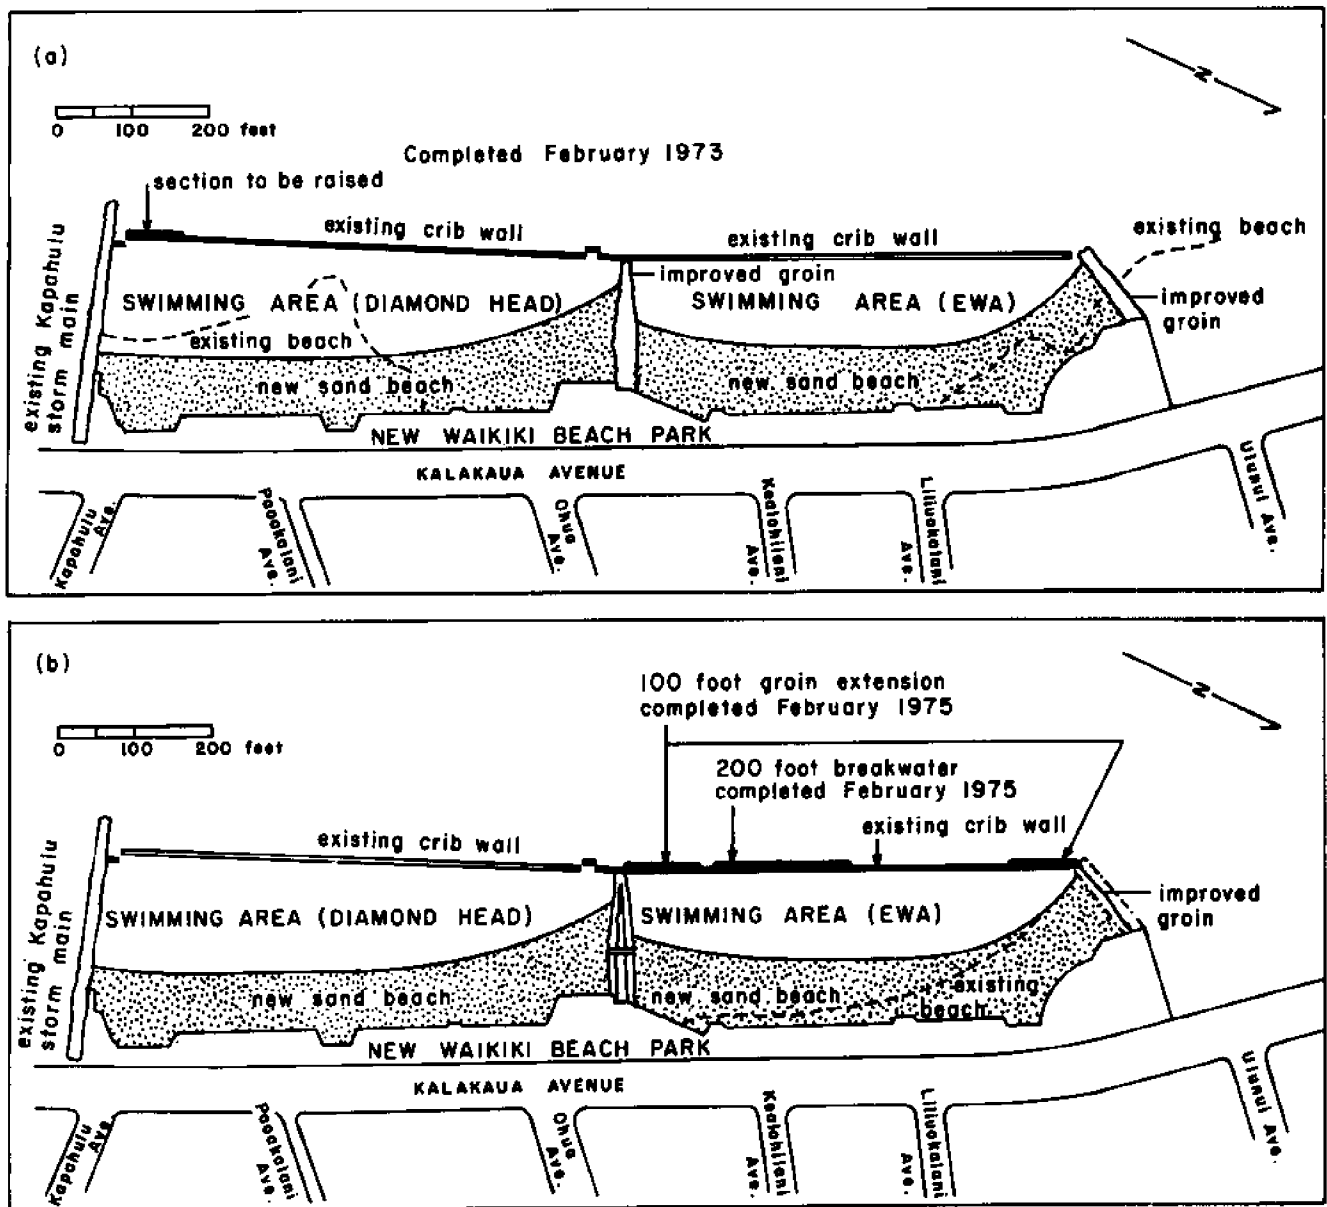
Kuhio Beach improvement plans: (a) 1973 and (b) 1975
